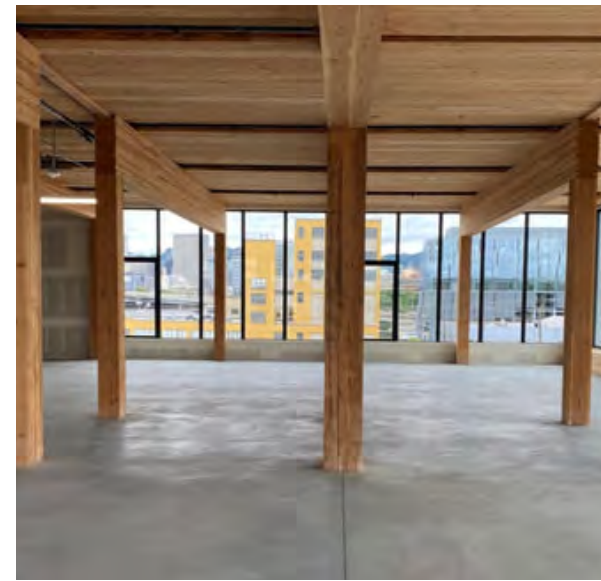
| One Direction Beam Structure and CLT Chases.
